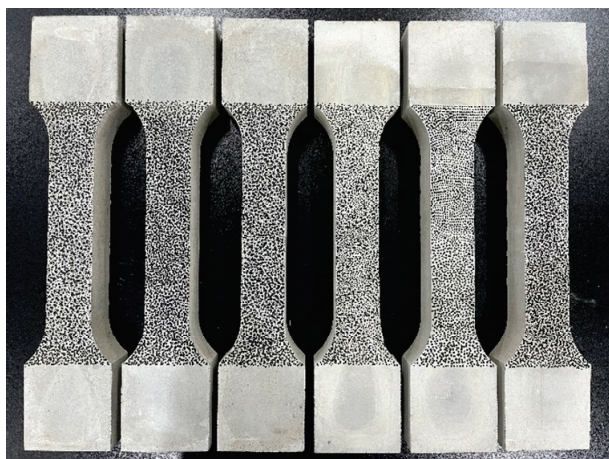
Physical drawing of quasi-static tensile specimen and speckle.
